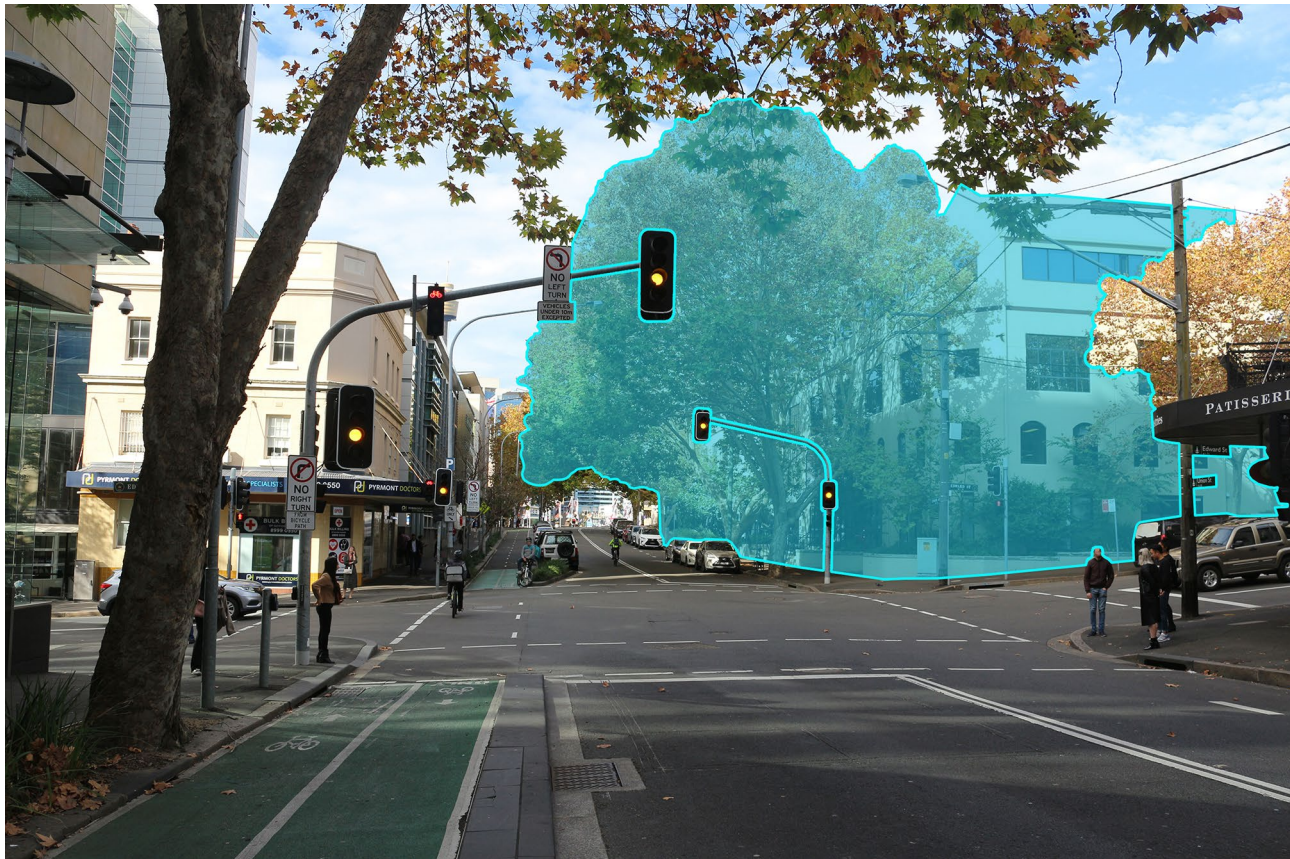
Pyrmont Station construction sites - View from Viewpoint 5, east along Union Street, indicative extent of demolition at Pyrmont Station eastern construction site (shown by blue shading)
